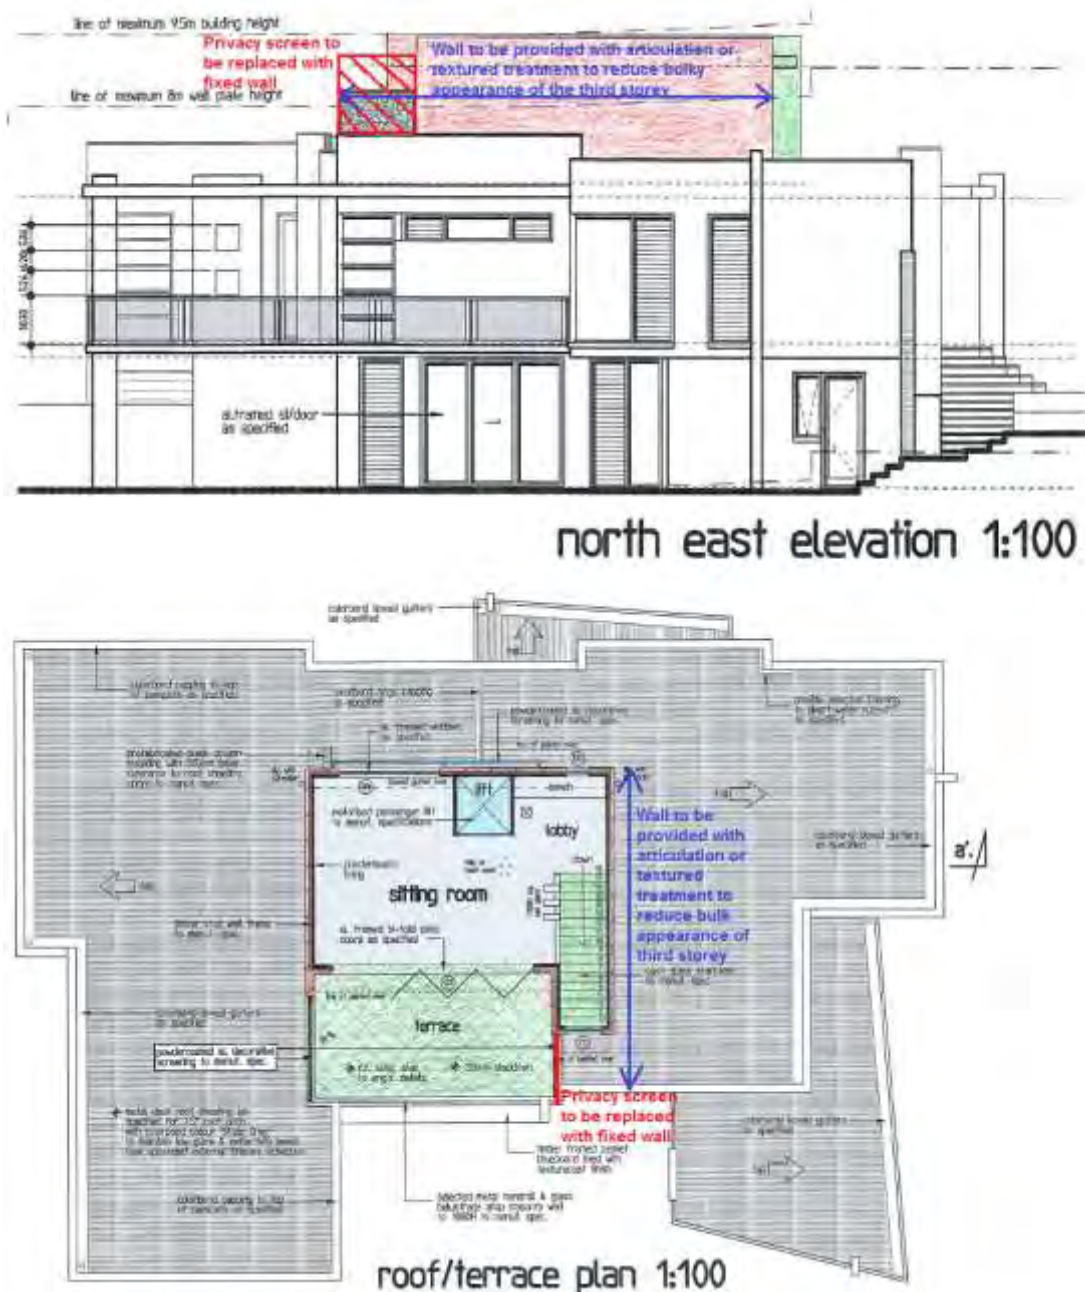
North east elevation and roof terrace plan showing recommended amendment to design to reduce acoustic impacts to neighbouring properties
